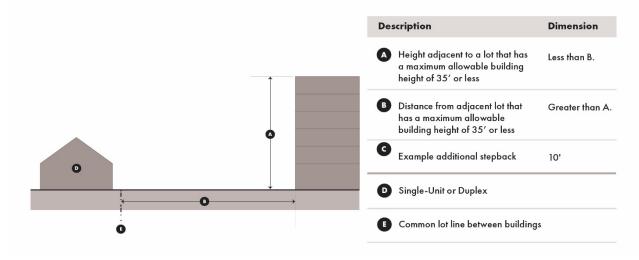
W: EXAMPLE OF 65-FOOT-TALL BUILDING ADJACENT TO A LOT THAT HAS A MAXIMUM BUILDING HEIGHT OF 35 FEET OR LESS (OR SEPARATED BY AN ALLEY) WITH NO REQUIRED UPPER-FLOOR STEP-BACK BECAUSE THE HORIZONTAL DISTANCE FROM THE COMMON LOT LINE IS GREATER THAN THE HEIGHT OF THE BUILDING
